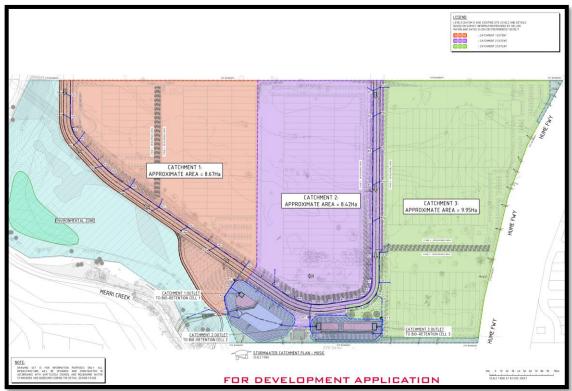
Proposed Catchment Plan (see Drawing CO14681.00-DA42)
